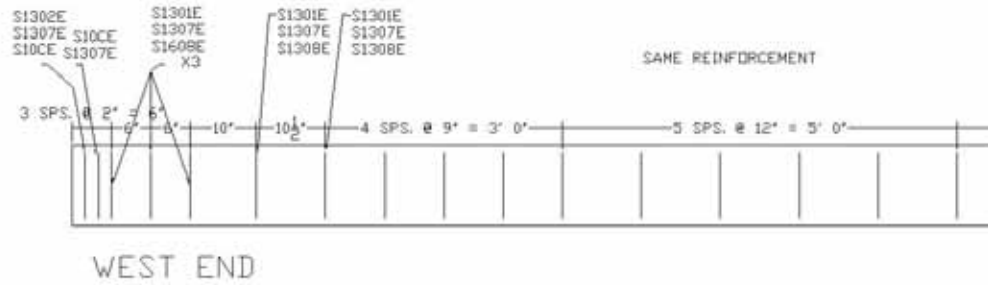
As-built reinforcement layout for Beam 2N (elevation view)
